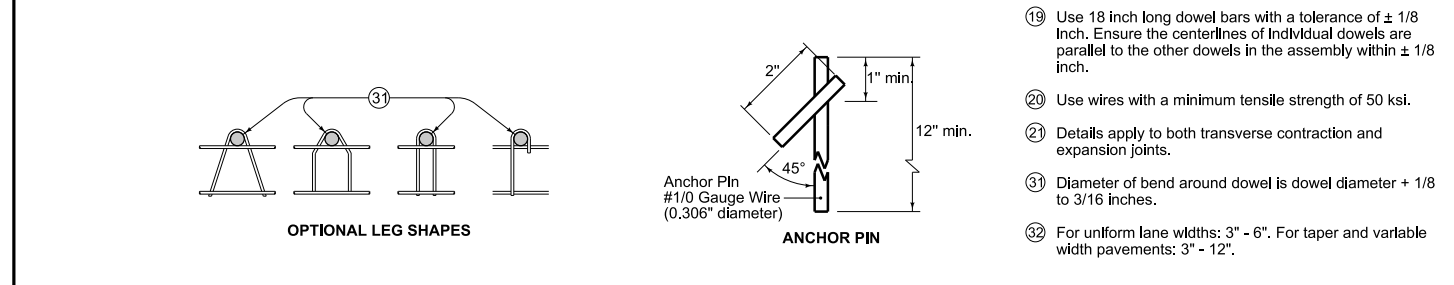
STANDARD ROAD PLAN		PV-101
